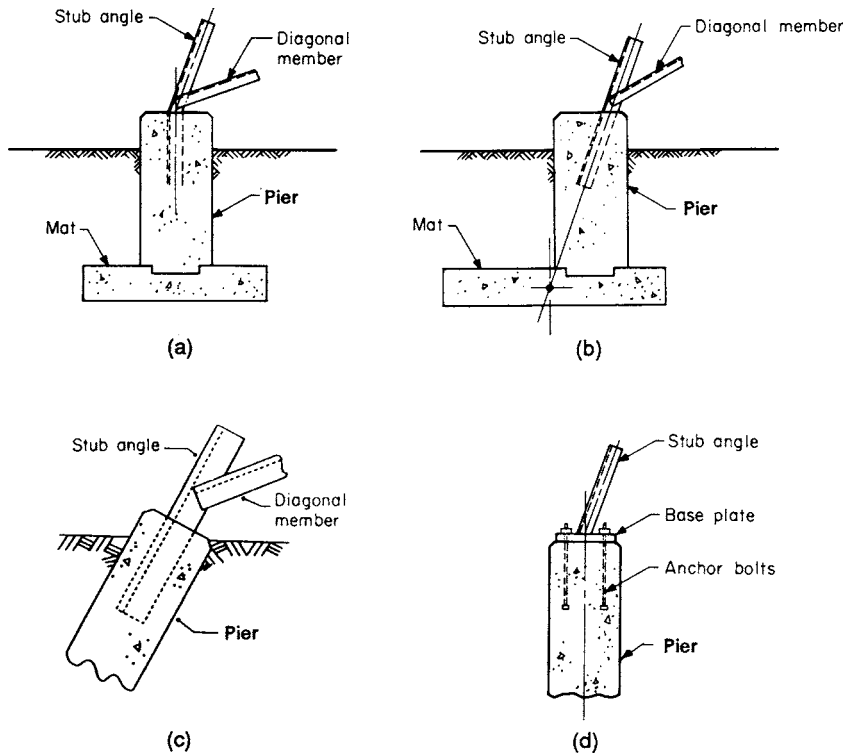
Typical concrete spread foundations (reinforcing not shown).
